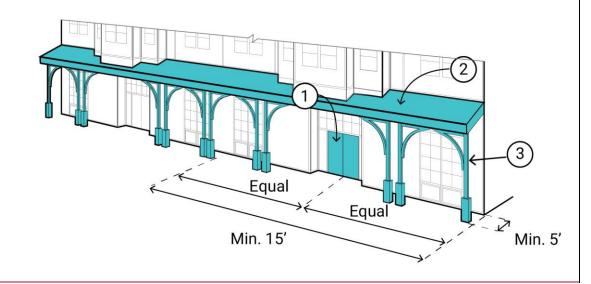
(B)(4)(b)(ii): Covered walkways or overhangs, certain streets — VMU District
